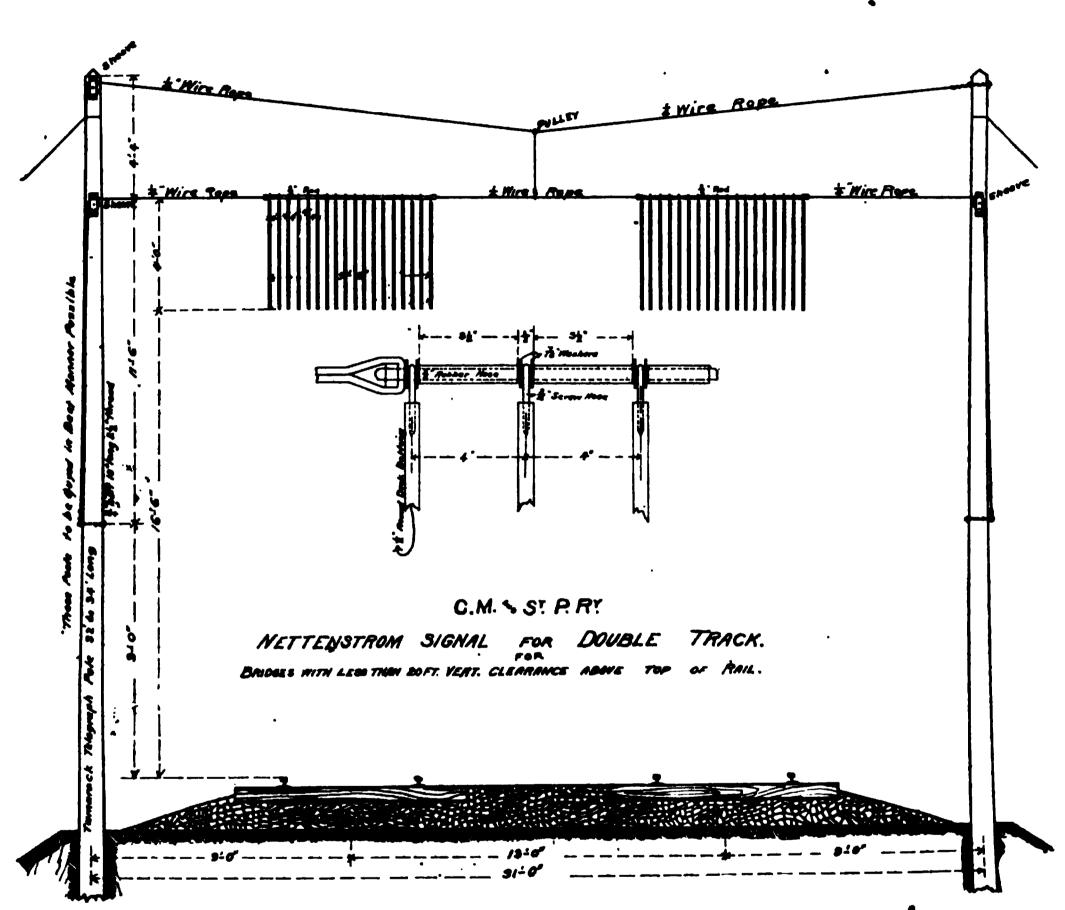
Nettenstrom Signal for Double Track, Chicago, Milwaukee & St. Paul Railway. (Plan No. 7, Committee Report on "Bridge Warnings.")
